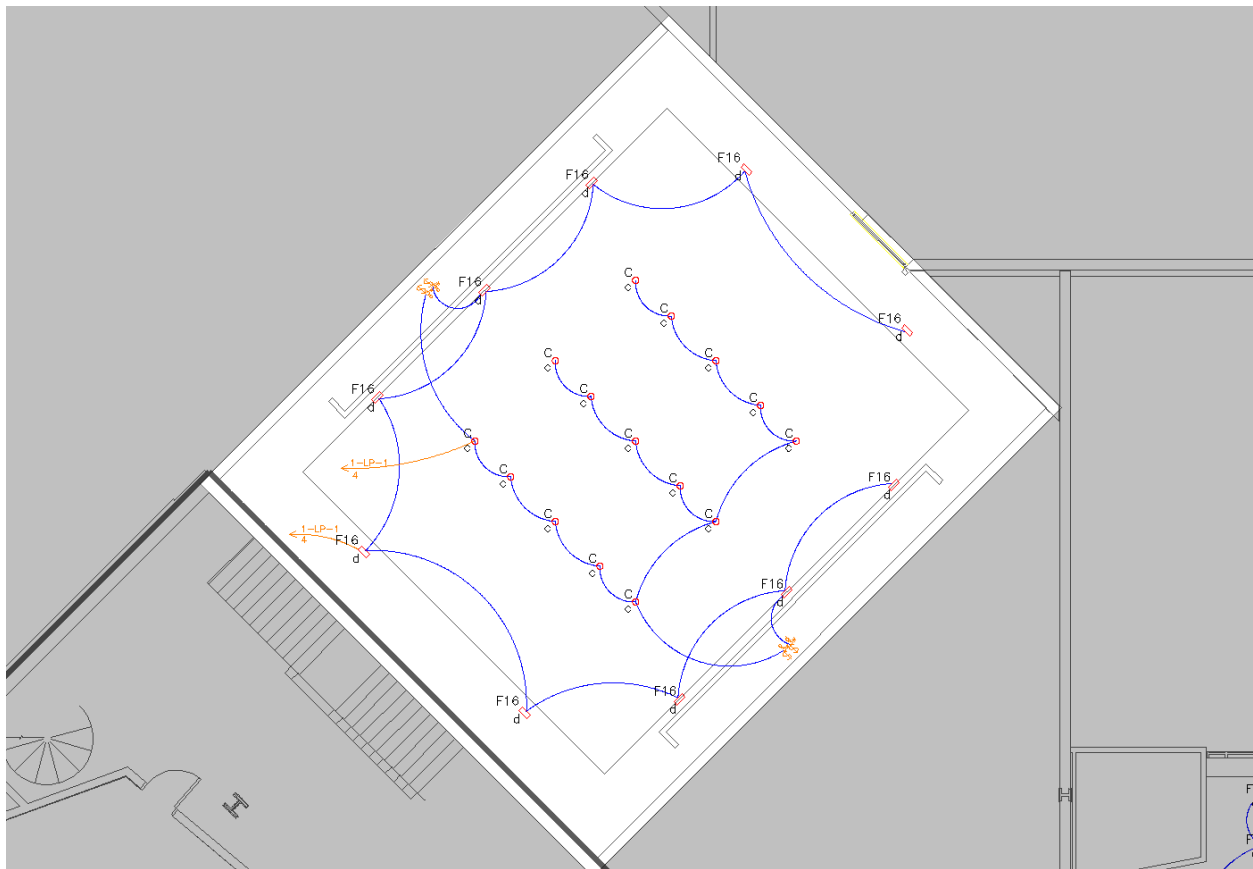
Rehearsal Room – Balcony Level Lighting Plan
